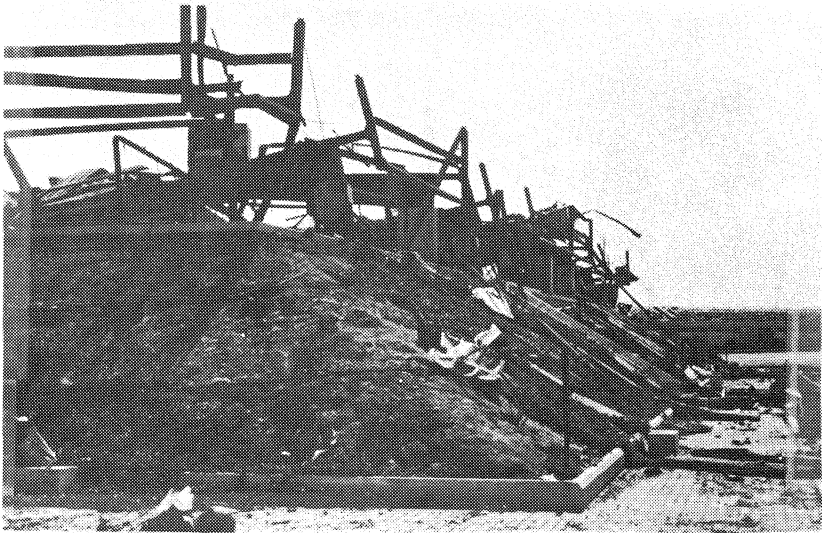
Large Steel Structure, after Direct Shelling, Suffered Total Collapse
